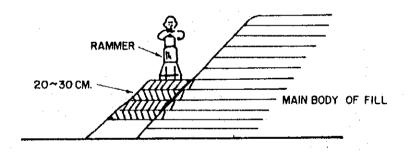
Slope Compaction with Tamper or Rammer
